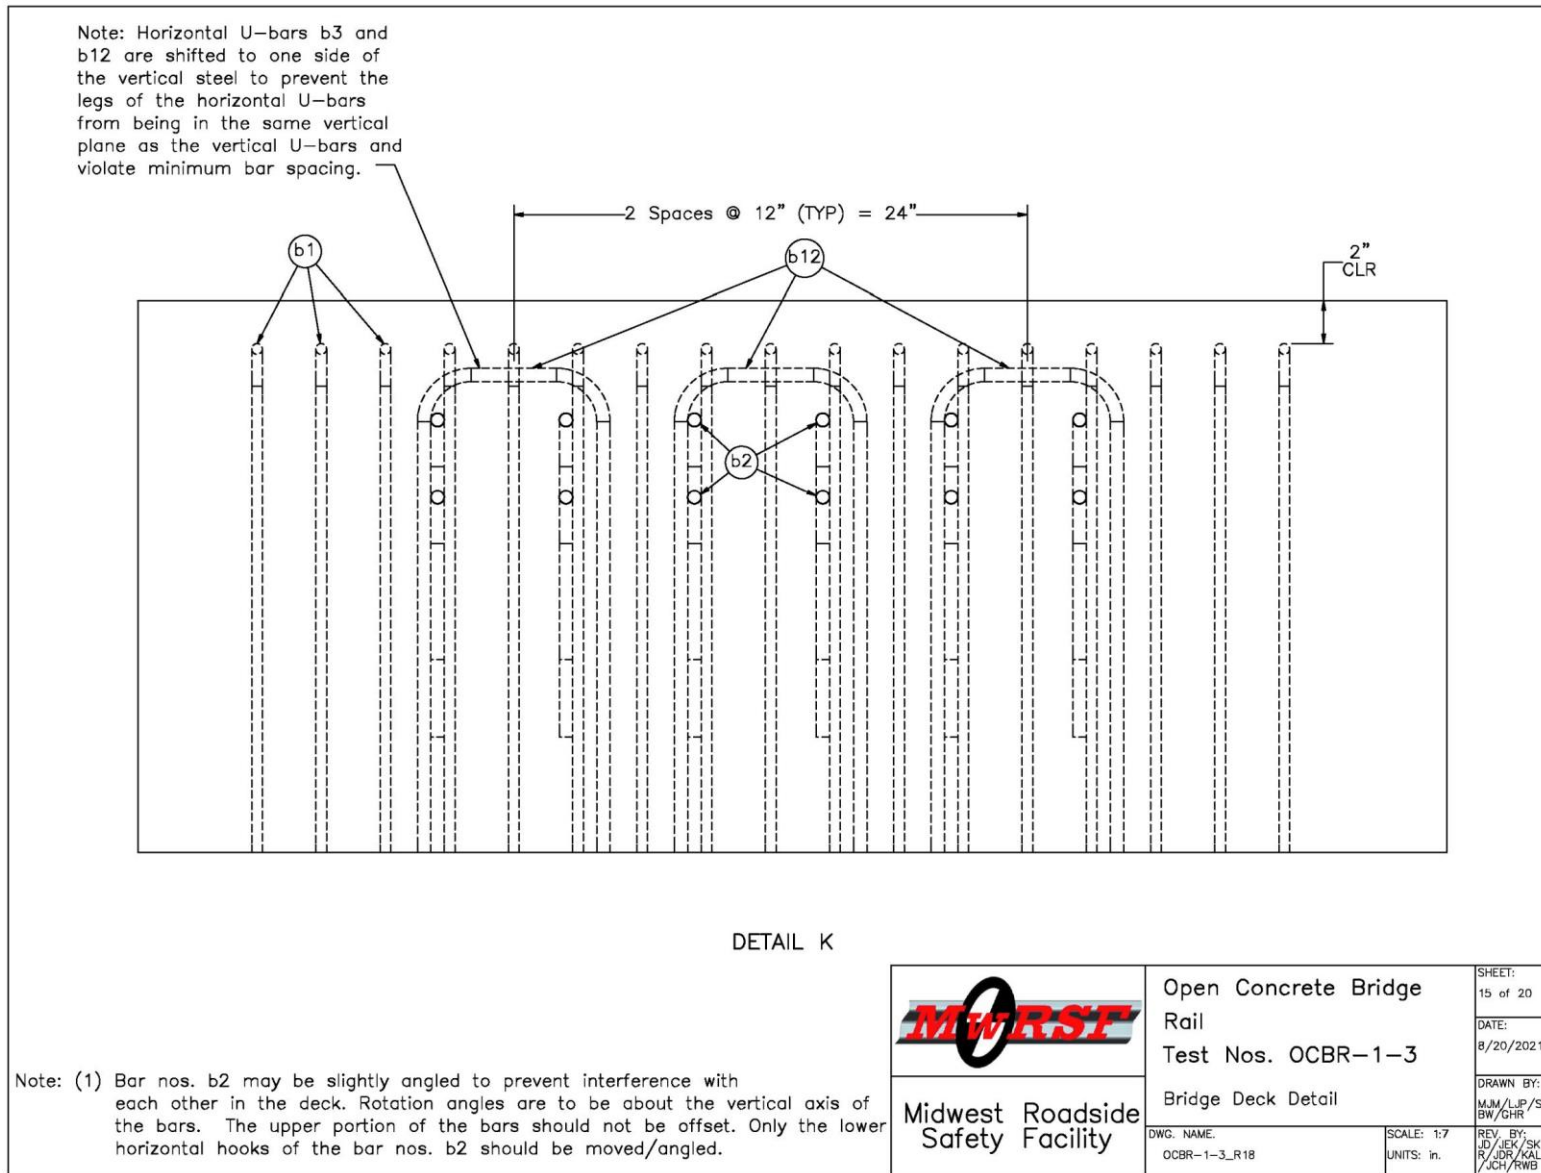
Bridge Deck Detail, Test Nos. OCBR-1, OCBR-2, and OCBR-3
